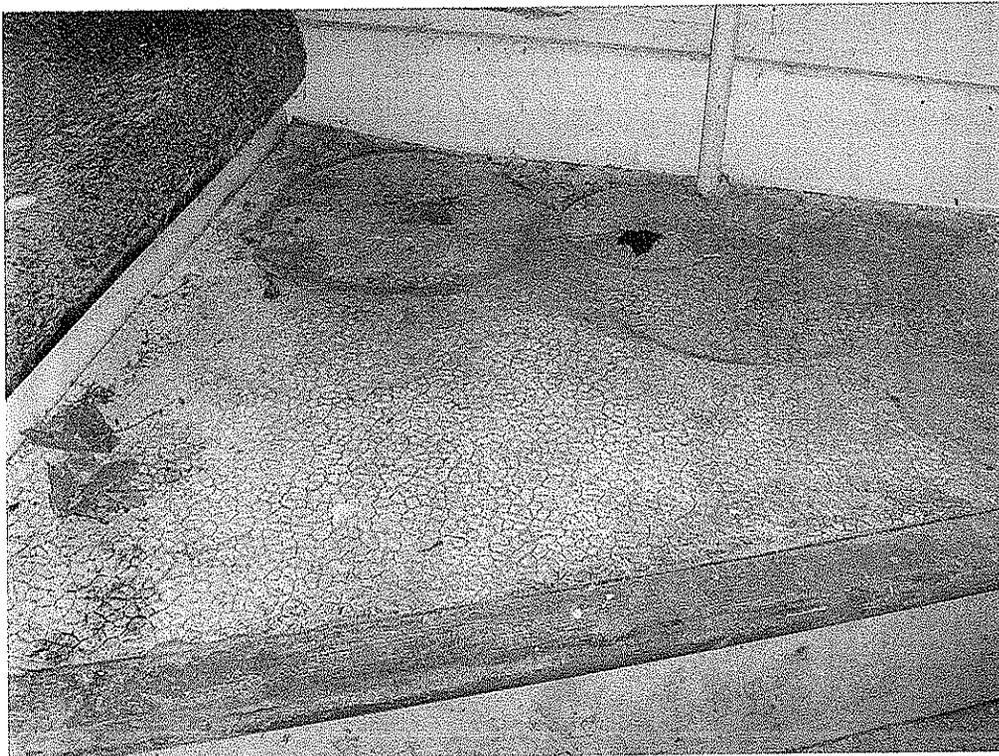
Asbestos containing sheet vinyl flooring located in basement rooms 004-A and B.
